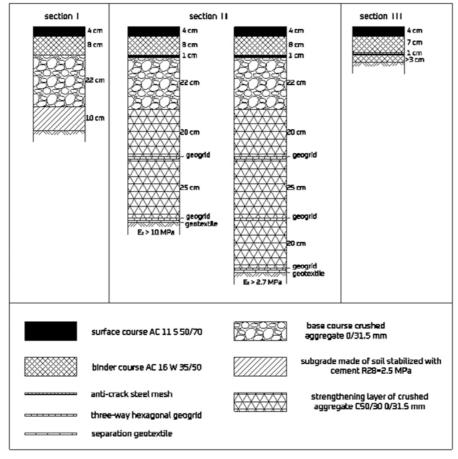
Design solutions for strengthening the subgrade and pavement [22]
